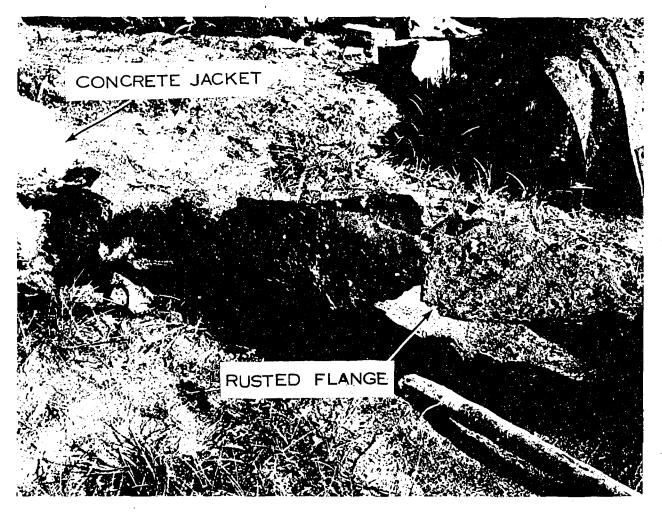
Steel bearing pile deterioration. Severe rusting occurred between concrete jacket and mud line. Note loss of sertion.
